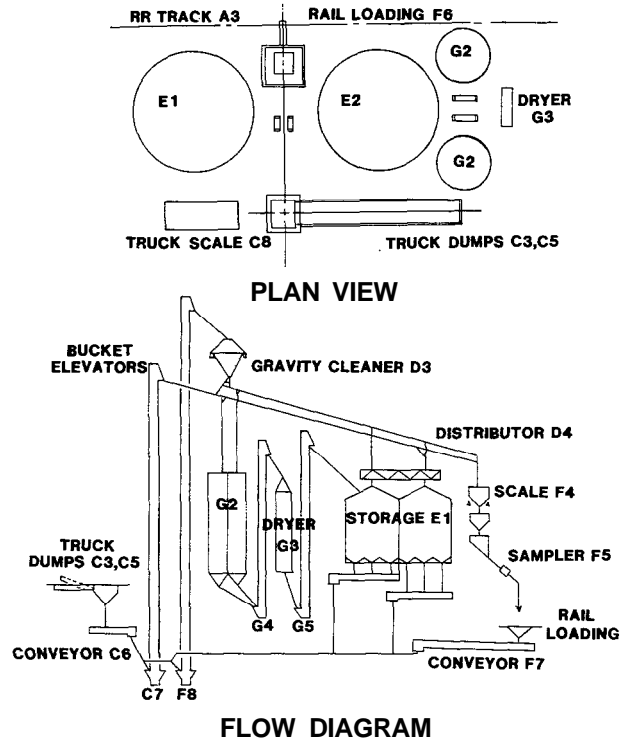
Flow diagram and plan view of 50-car loadout soybean facility.
